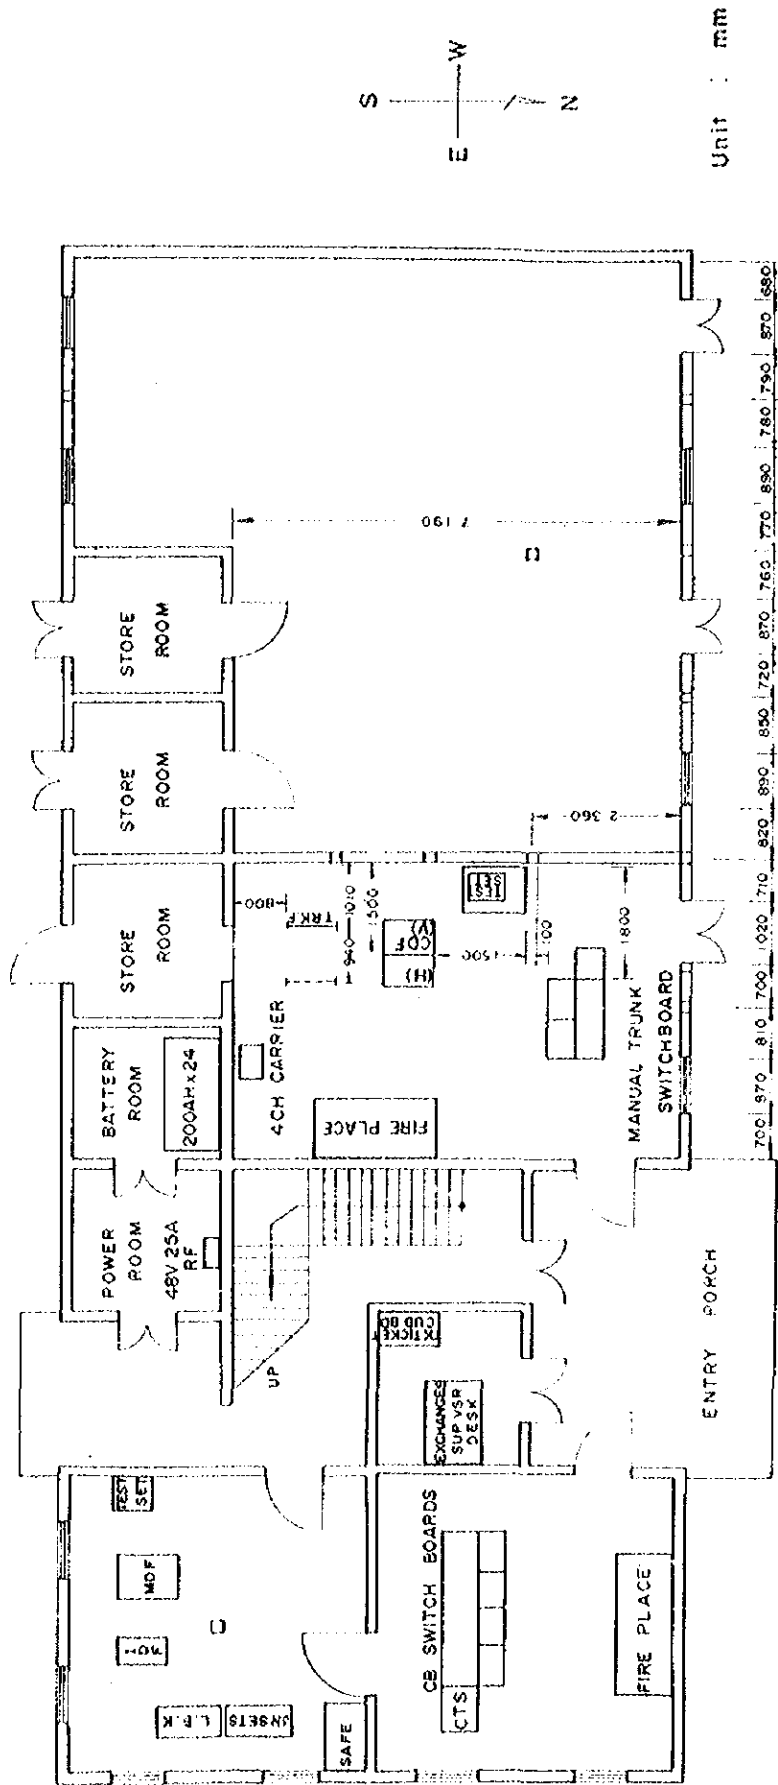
Floor Layout of Maymyo MDF Room
